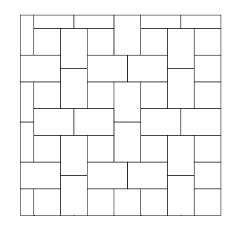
Illustration of concrete Pavers Typ. Paver Install
